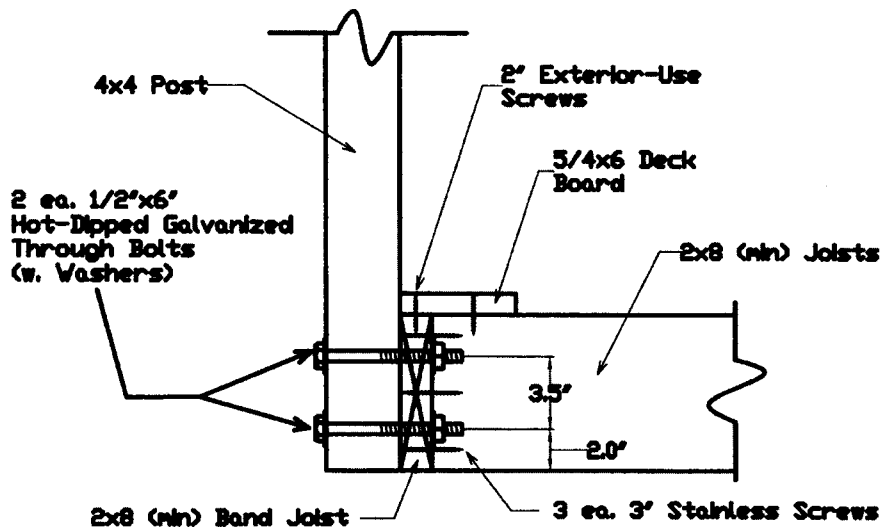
This guardrail post detail “looks” very strong as it utilizes two 1/2-by-6-inch bolts, yet in a series of tests, the average failure load was only 47% of the test load requirement for a code-conforming design.
